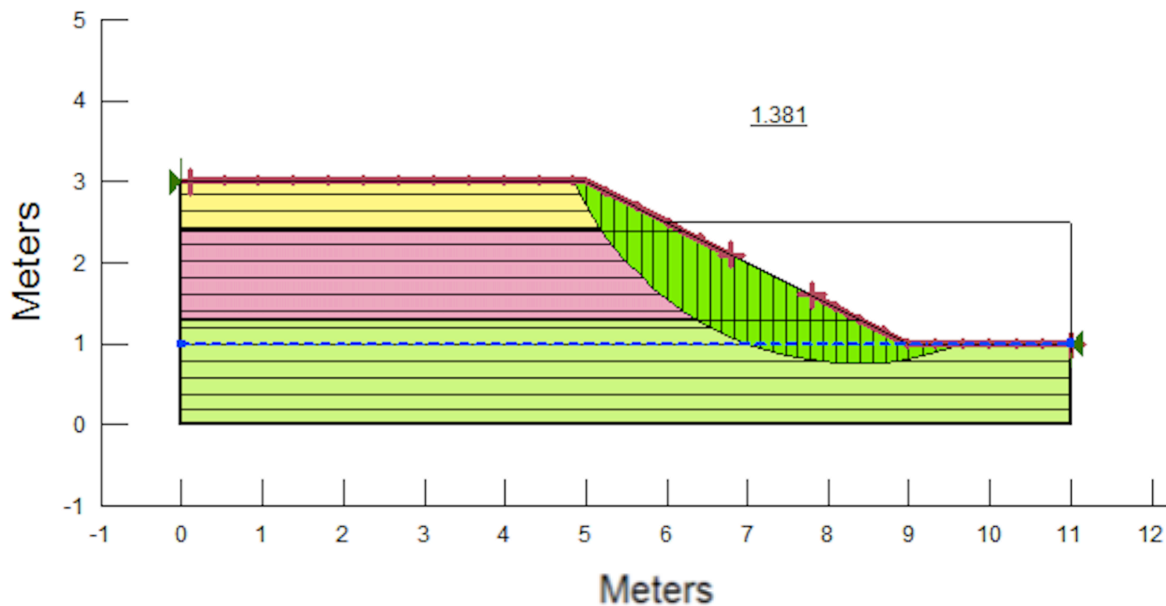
GEOTECHNICAL DESIGN OF A TYPICAL CROSS SECTION
